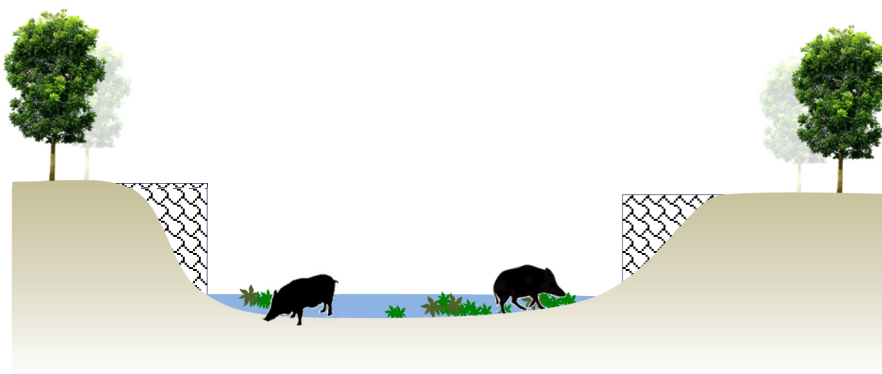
ANIMALS COULD BE TRAPPED IN CHANNEL WITH VERTICAL EMBANKMENT WITHOUT PROVISION OF ANIMAL CORRIDOR
